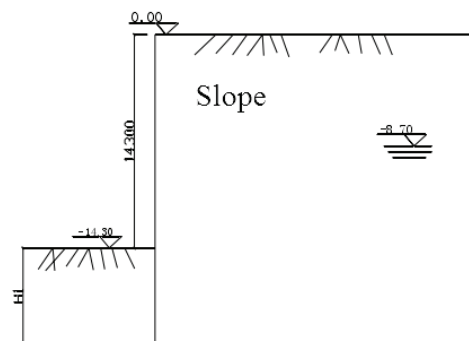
Calculation sketch of soil pressure on the south side slope of foundation pit.
